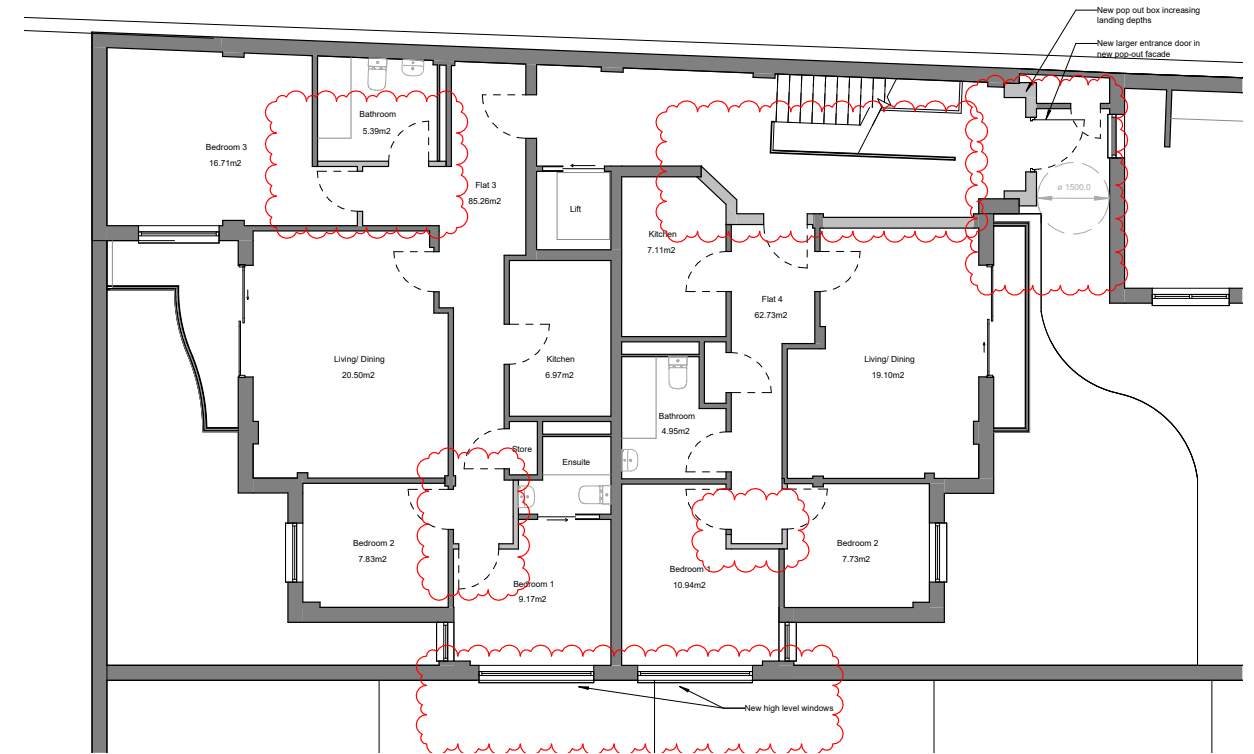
BLOCK 3 PROPOSED GROUND FLOOR PLAN
